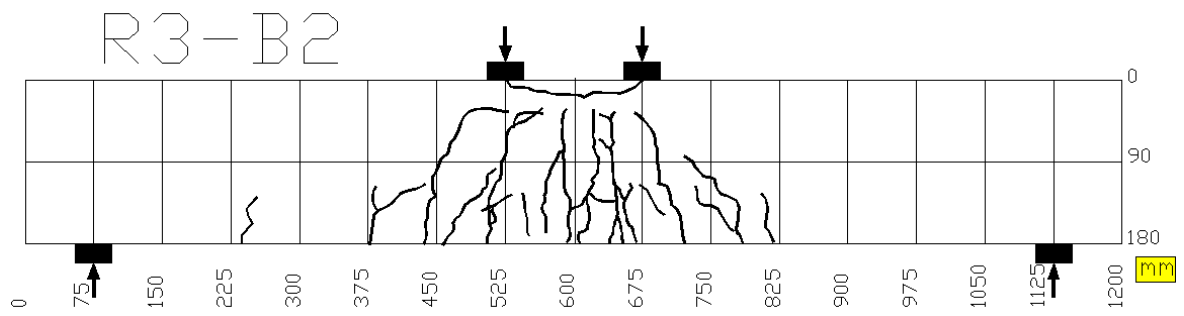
Crack Pattern for Beam (R3-B2) At Failure
